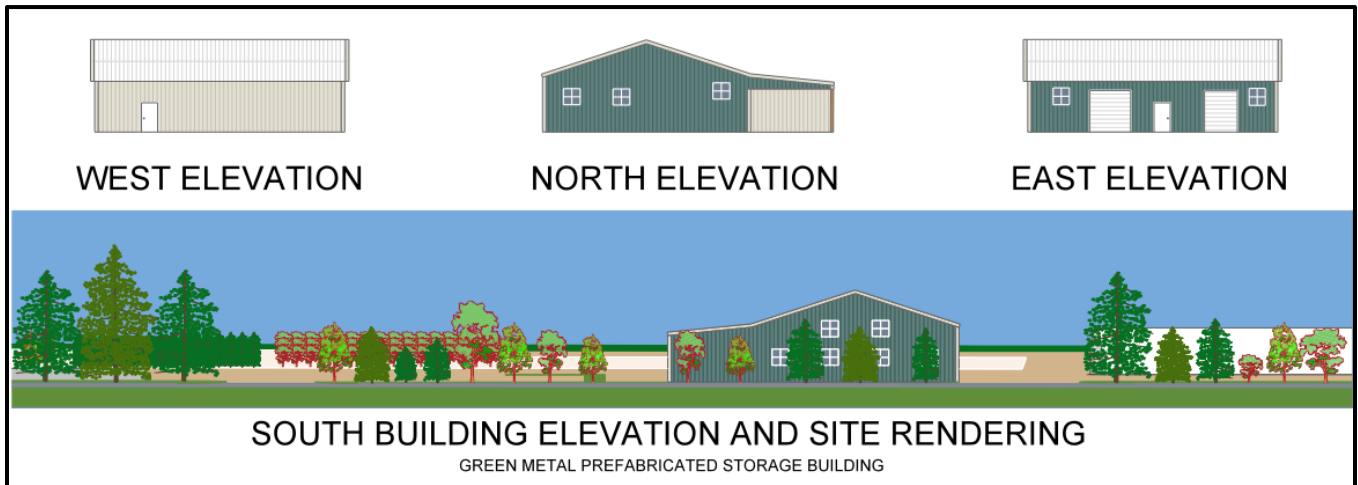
Pole Barn Elevations (Tool Storage Building and Existing Utility Building)
